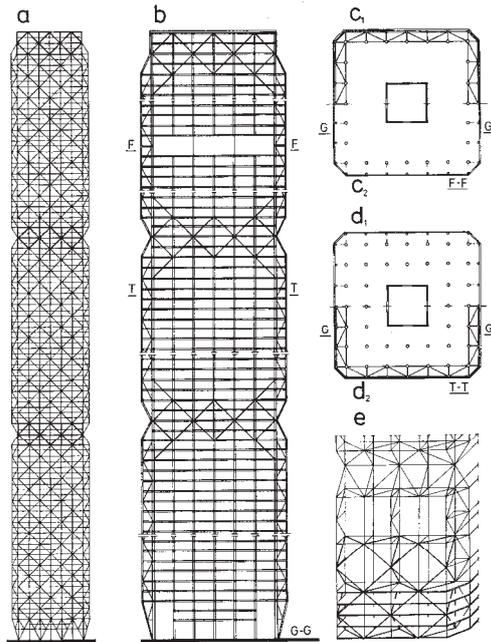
General schemes of a structural system of a tall building shaped as a special form of the circumferential bearing space frame
